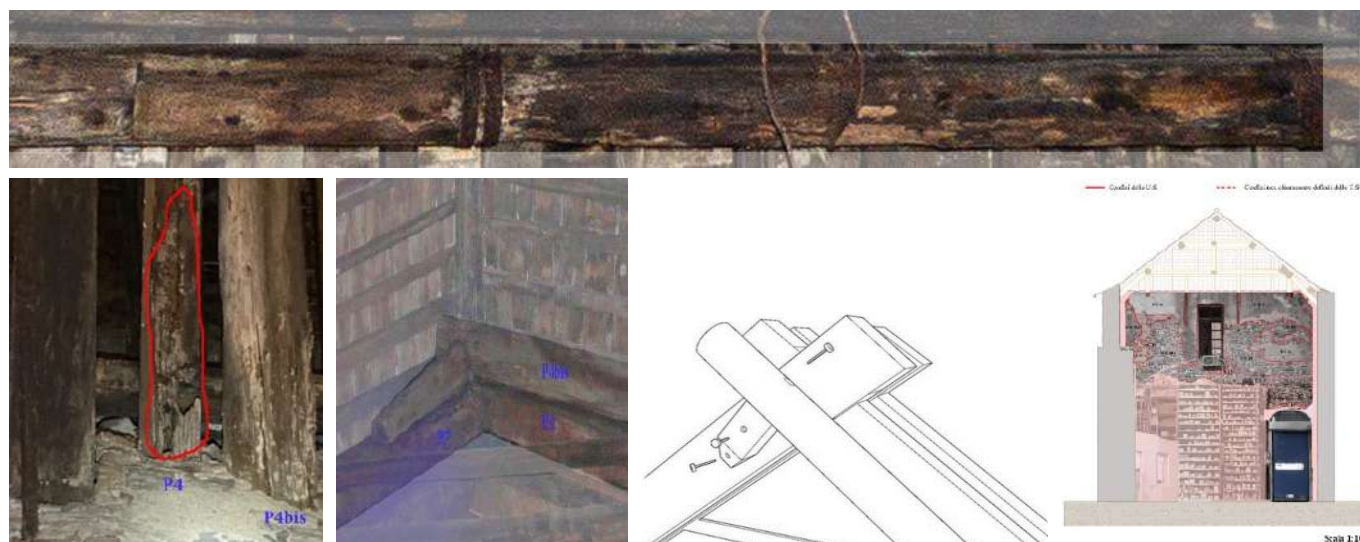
Parts of the roof showing interventions following construction [13, 16].
